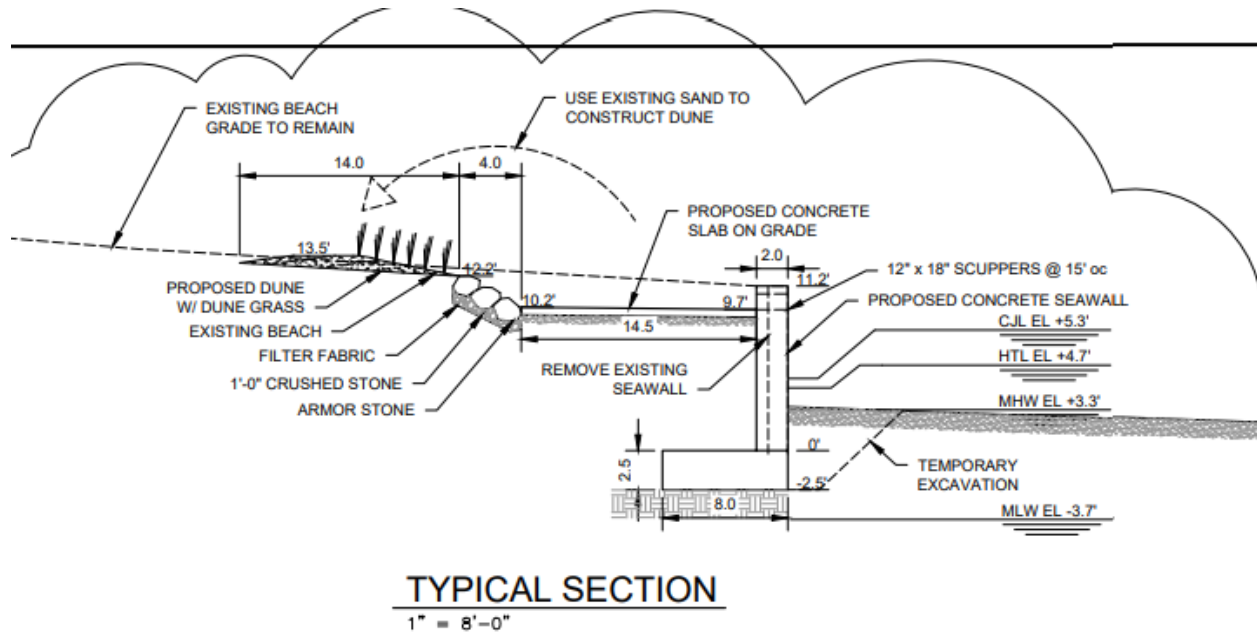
Section, [Site Plan by Sound Engineering, dated 2/16/25, revised 2/20/26](#)
